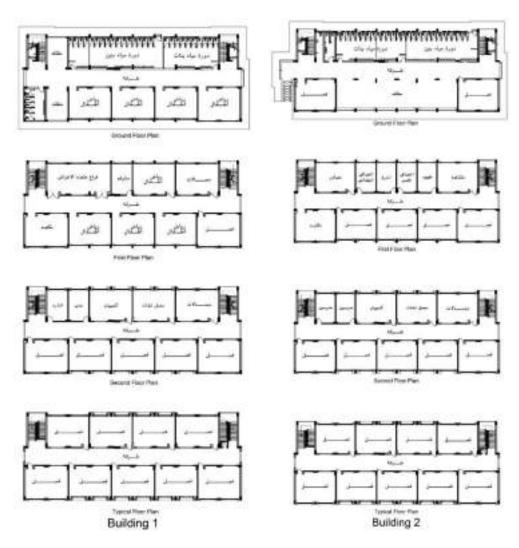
ENC5 Floor Plants - Northern building (1), Eastern building (2) (GAEB, 2021)
